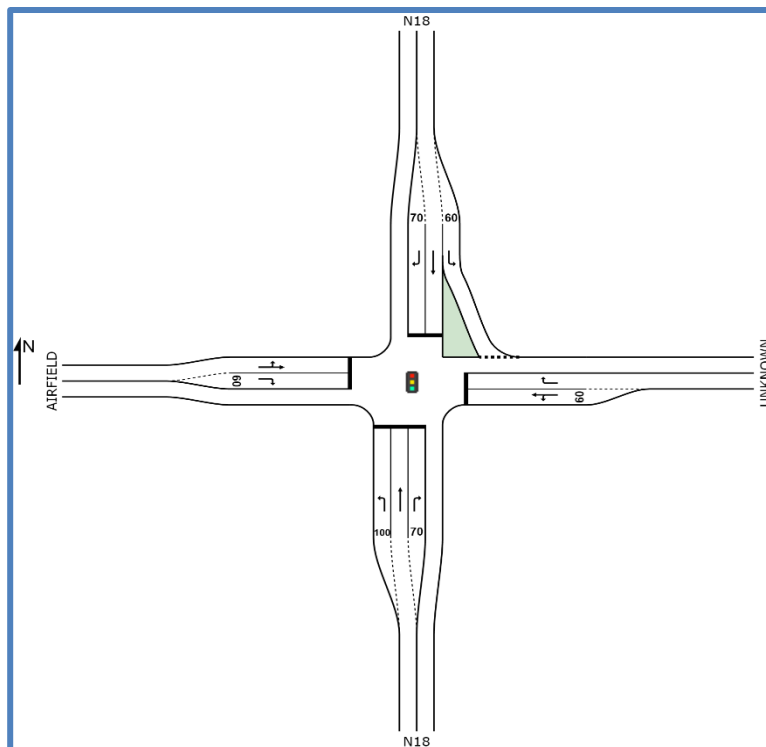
Proposed Layout of N18 and Nelson Mandela Street Intersection
